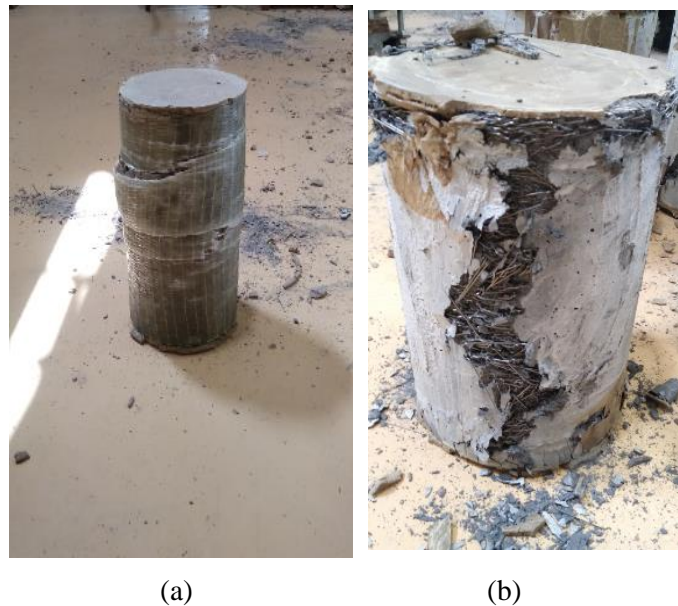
(a) Typical failure of concrete specimen confined with glass FRP (b) Typical failure of concrete specimen confined with SIFCON with 12 percent fibers
